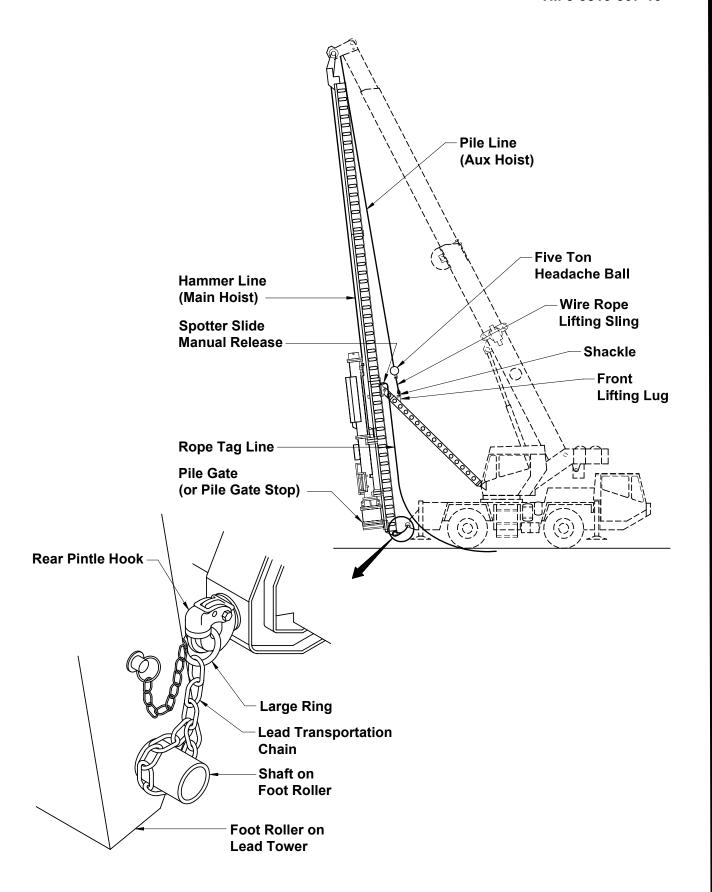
Relocating the Crane While Rigged with Pile Driver System
